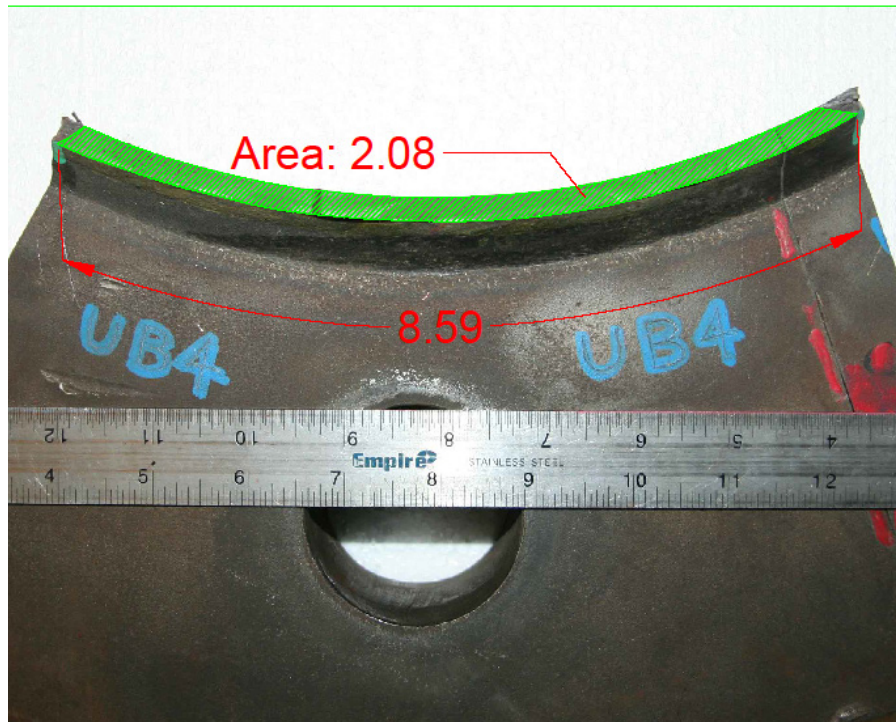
Photo. Specimen 1U2 fracture surface.
